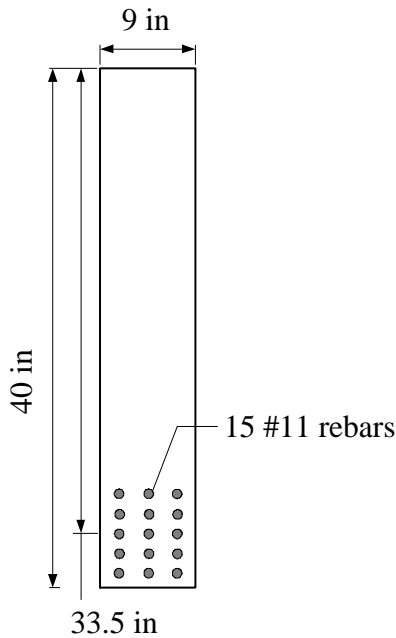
Section dimension and arrangement of longitudinal reinforcement steel rebars for section UHP/St60 40R-1
